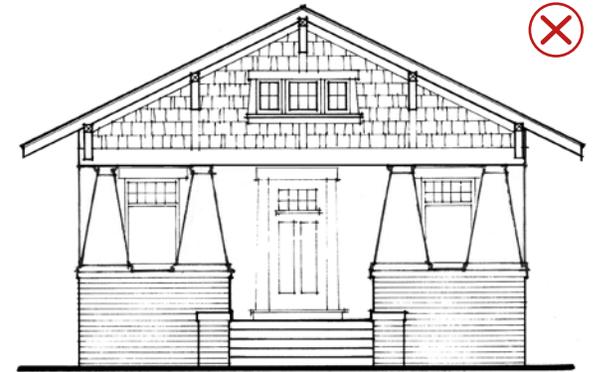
Detailing a porch with non-traditional elements creates a false sense of history and is inappropriate.
